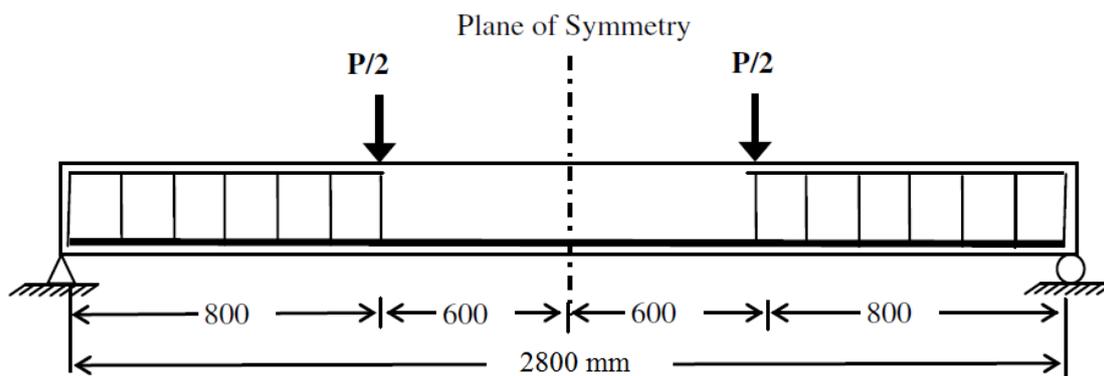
Longitudinal profile of reinforced concrete beam [14]
